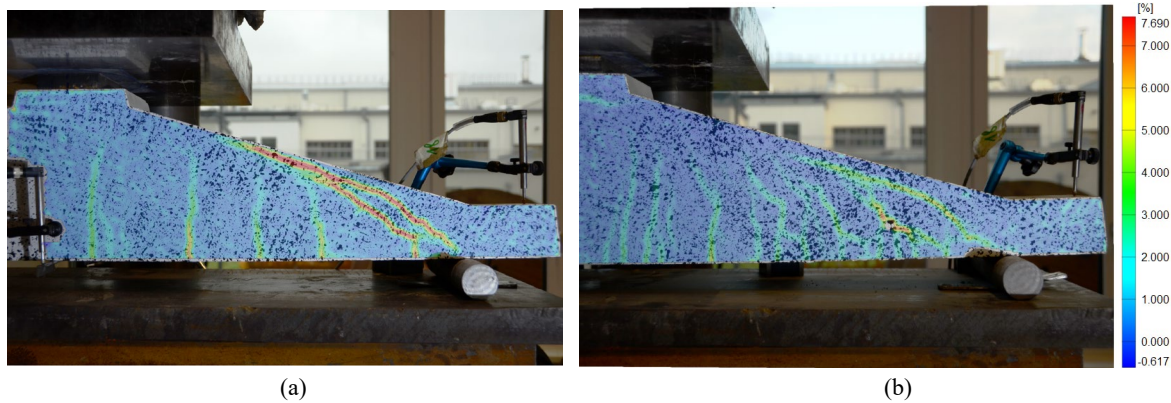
Crack pattern before failure: (a) without and (b) with additional stress-aligned reinforcement
